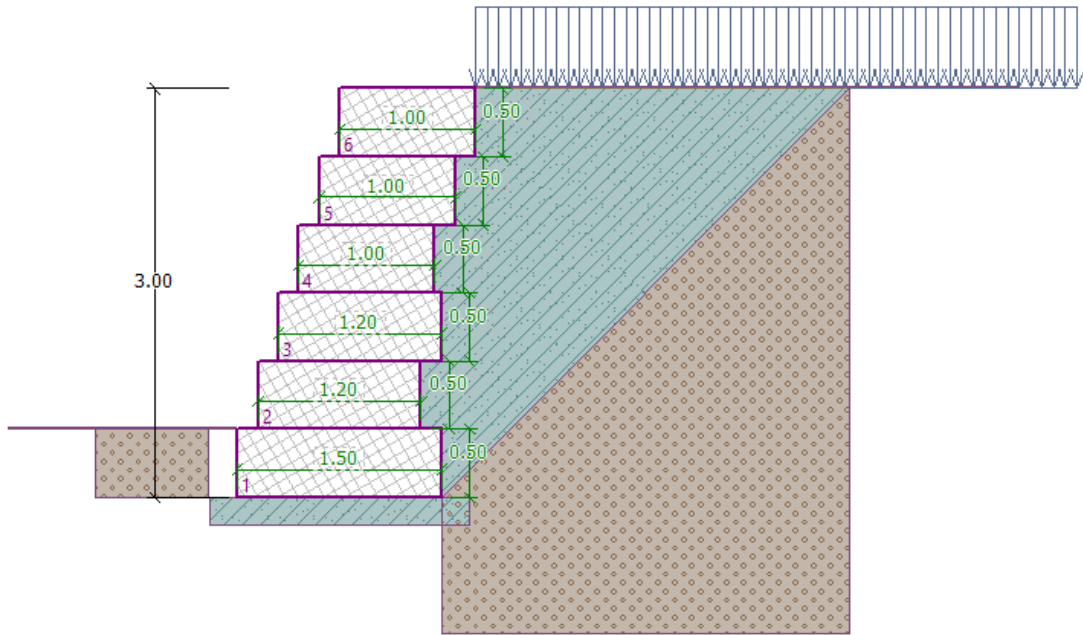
Sample of Category 2 Retaining Wall with a Road Behind
